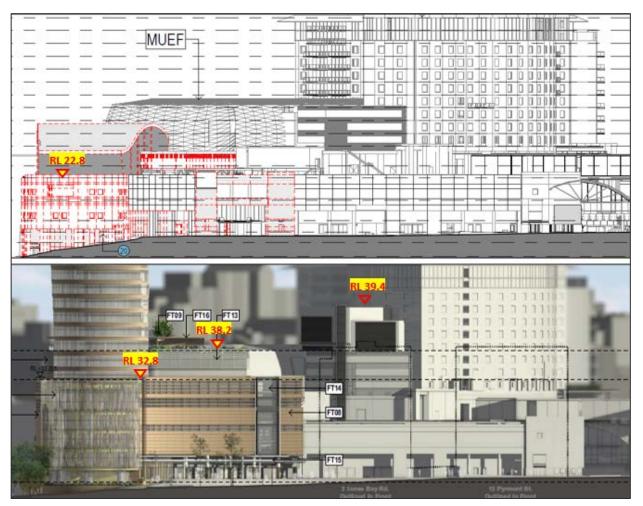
| Existing (above) and proposed Jones Bay Road podium elevation (note: red dashed line denotes demolition) (Base source: Proponent's Architectural drawings)
